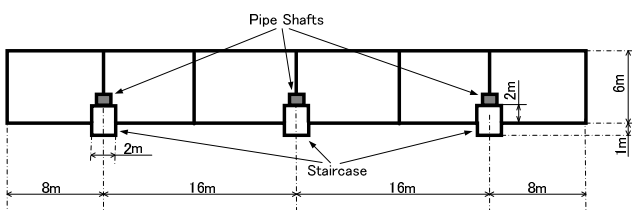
Dimensions of the Apartment Building. (5-storied building)
